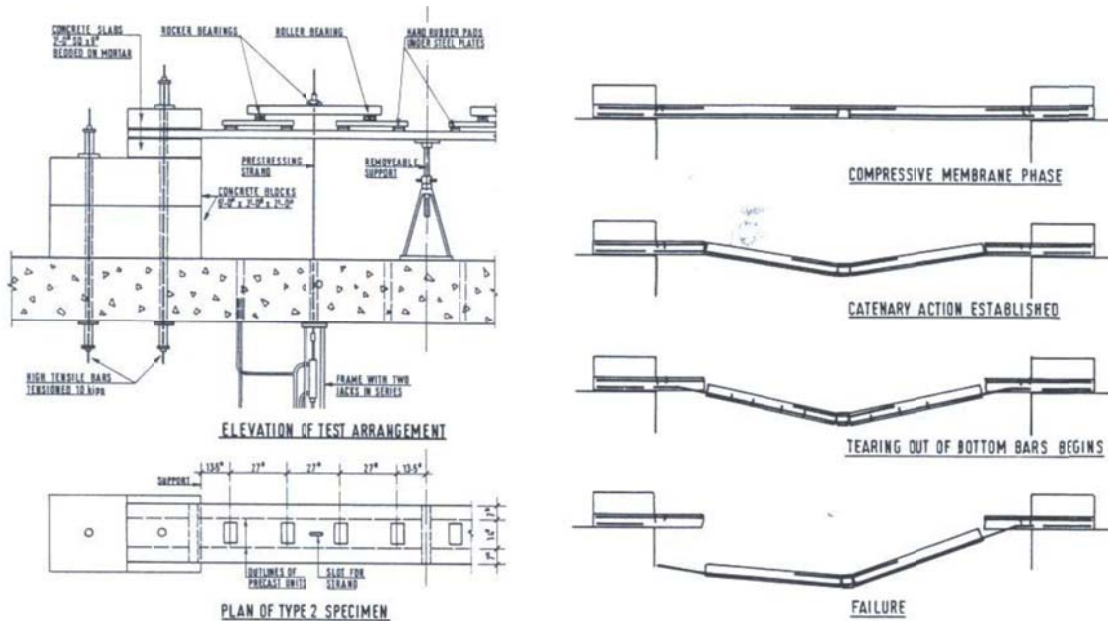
Catenary tests of precast floor strips (Regan, 1975)
